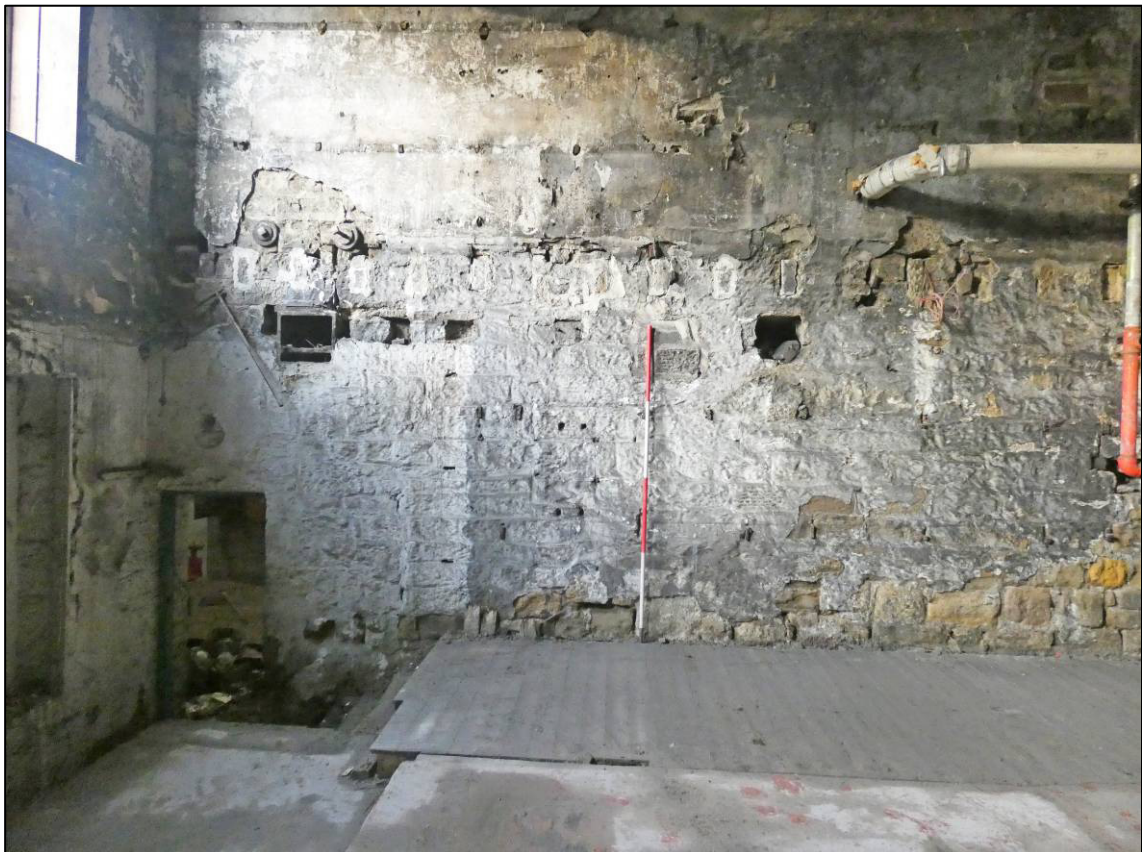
Southern engine house, ground floor after stripping out, west wall, looking W (photo 2335).
